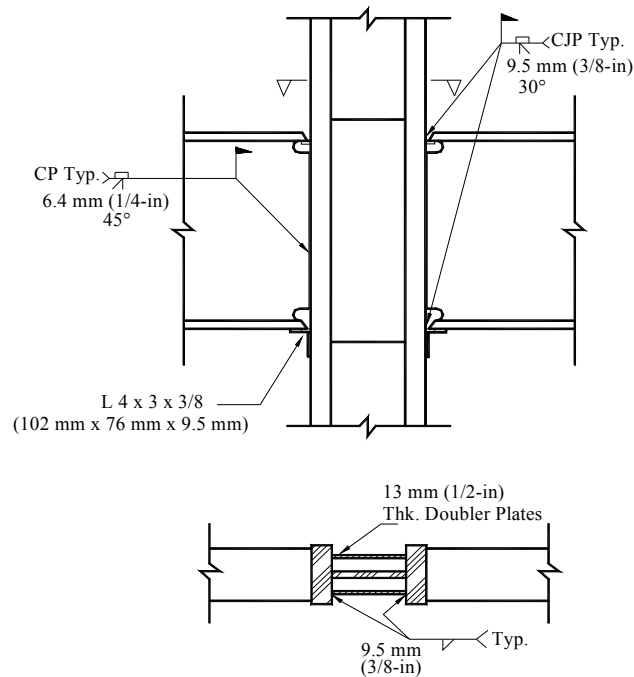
Elevation View at Perimeter of the DPW Building [Chen et al., 2001]
